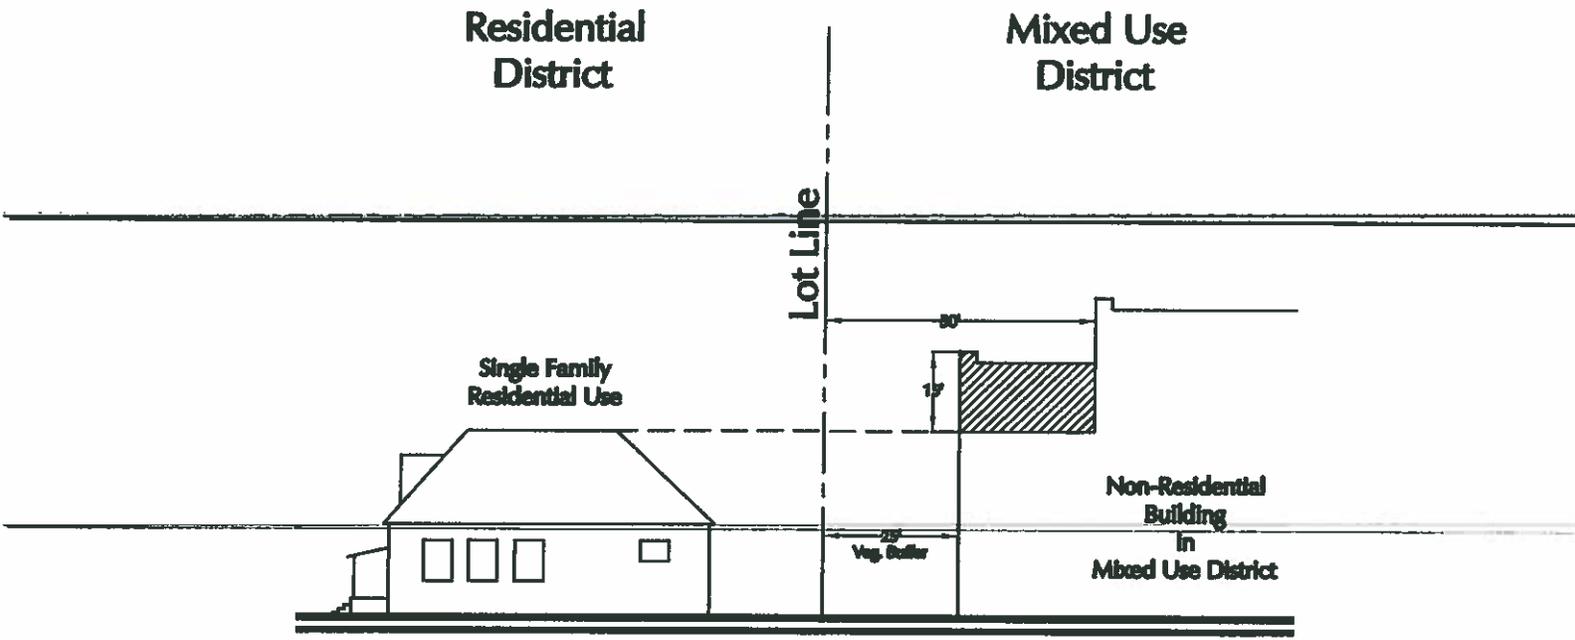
Height Restrictions between Single Family Residential Use within a Residential District and a Mixed Use Building within a Mixed Use District.
